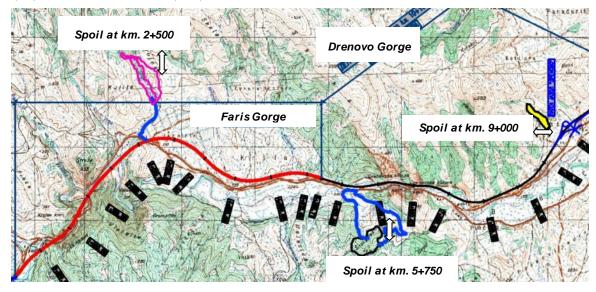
Locations of deposits for excess soil for sub-sections Faris and Drenovo Gorge
